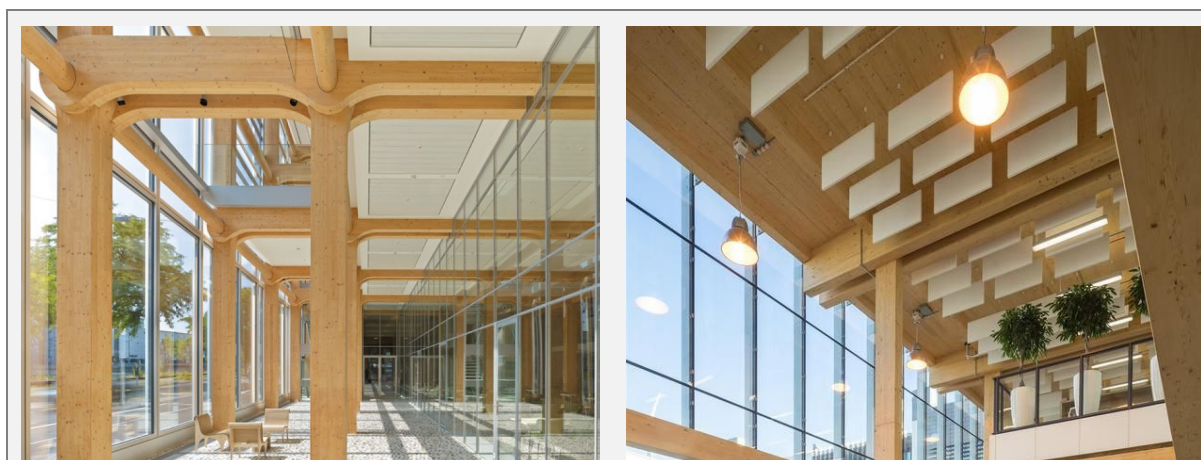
22. Double timber beams applied in constructed buildings: at right Tamedia Building and at left Sky believes in better building.
